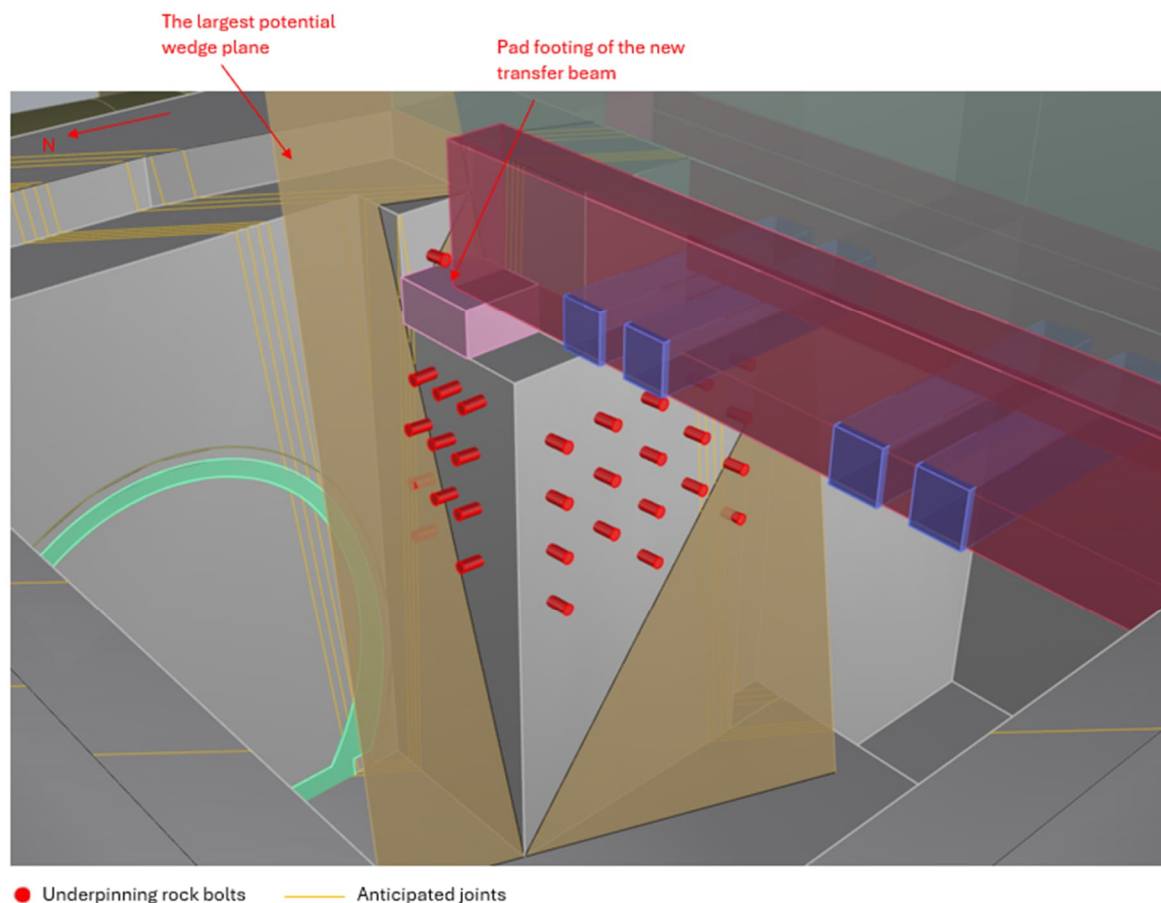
Underpinning design model (NB – 3D image of the pillars, jointing, and bolts)
